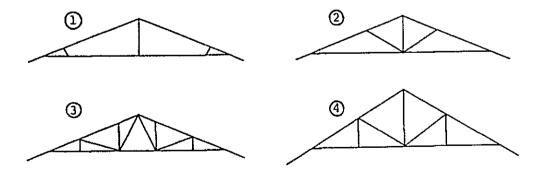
ROOF TRUSS SYSTEM IN PERUMNAS HOUSING
